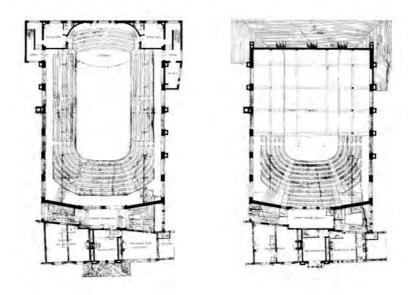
First and Second Floor Plans of the Victoria Hall, Bolton (1900). Source: Bradshaw Gass and Hope.
